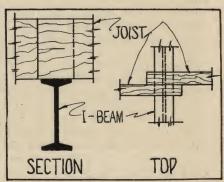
Wood Joist Resting on Top of Steel Beam. The joists are lapped and fastened together with a few nails.
